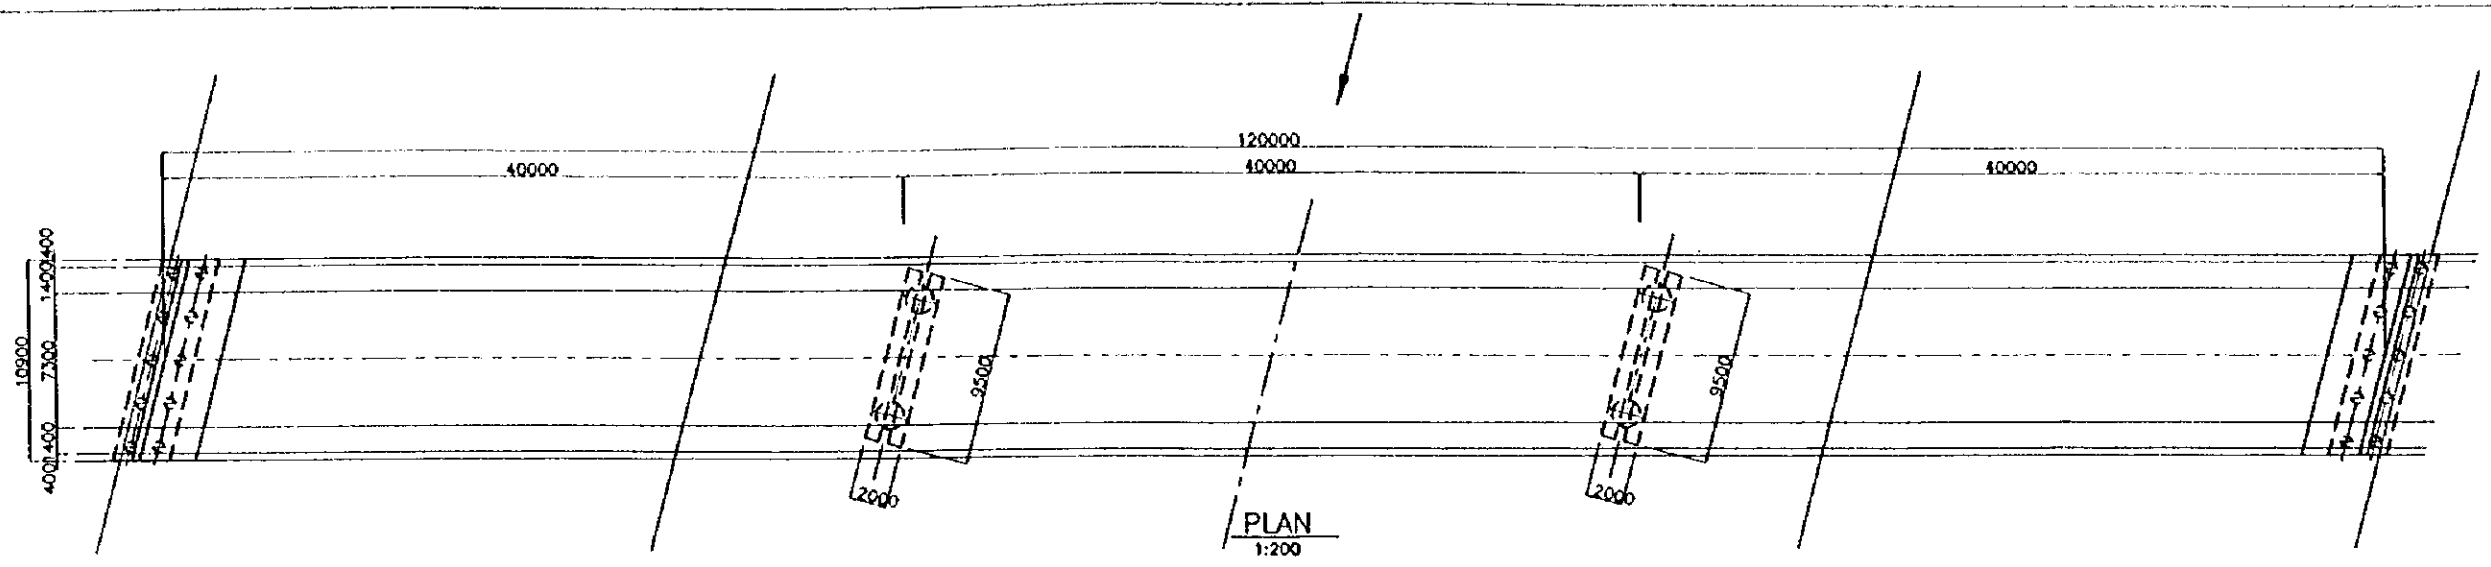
Design of Queens Road Bridge for 20 Year Return Period Flood
